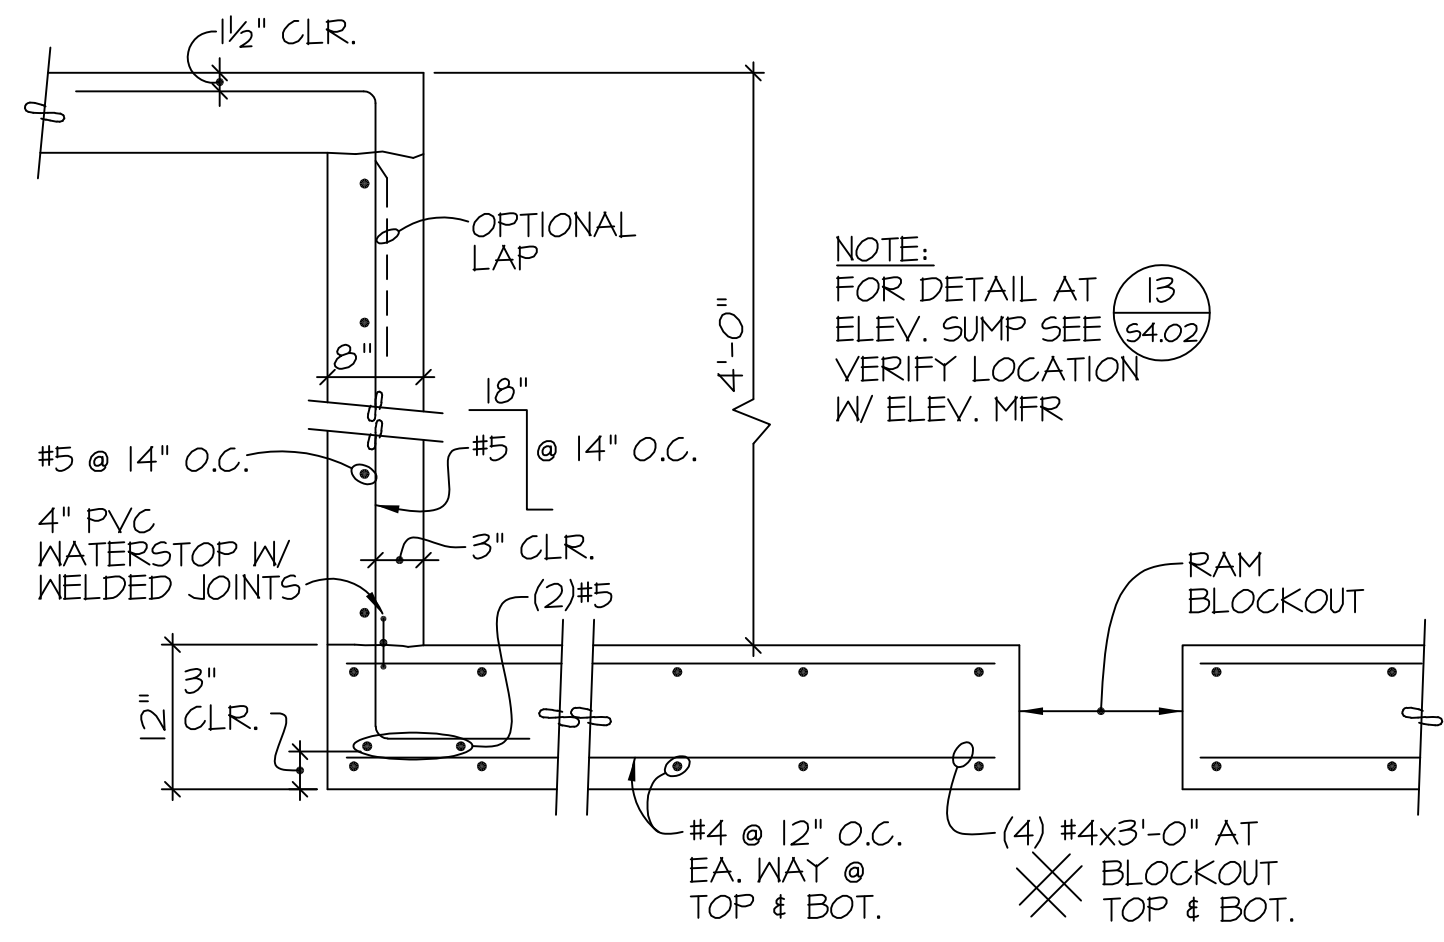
TYPICAL SLAB STEPS OR DEPRESSIONS NO SCALE
